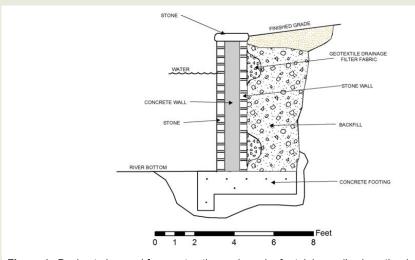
Design to be used for construction and repair of retaining walls along the river.
